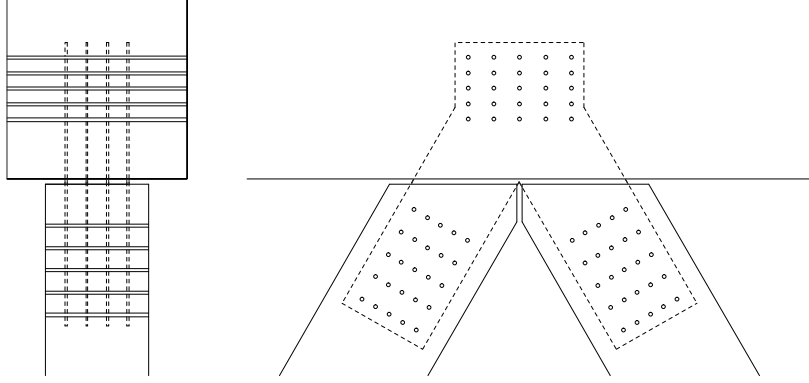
Connection detail based on multiple-steel-plate dowel-type connection used for the Rena river bridge (Abrahamsen; 2008)
